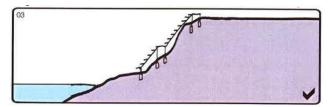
j: New access stairways should have minimal disruption to the landform. They should be lightweight and constructed from steel or timber.(I)
